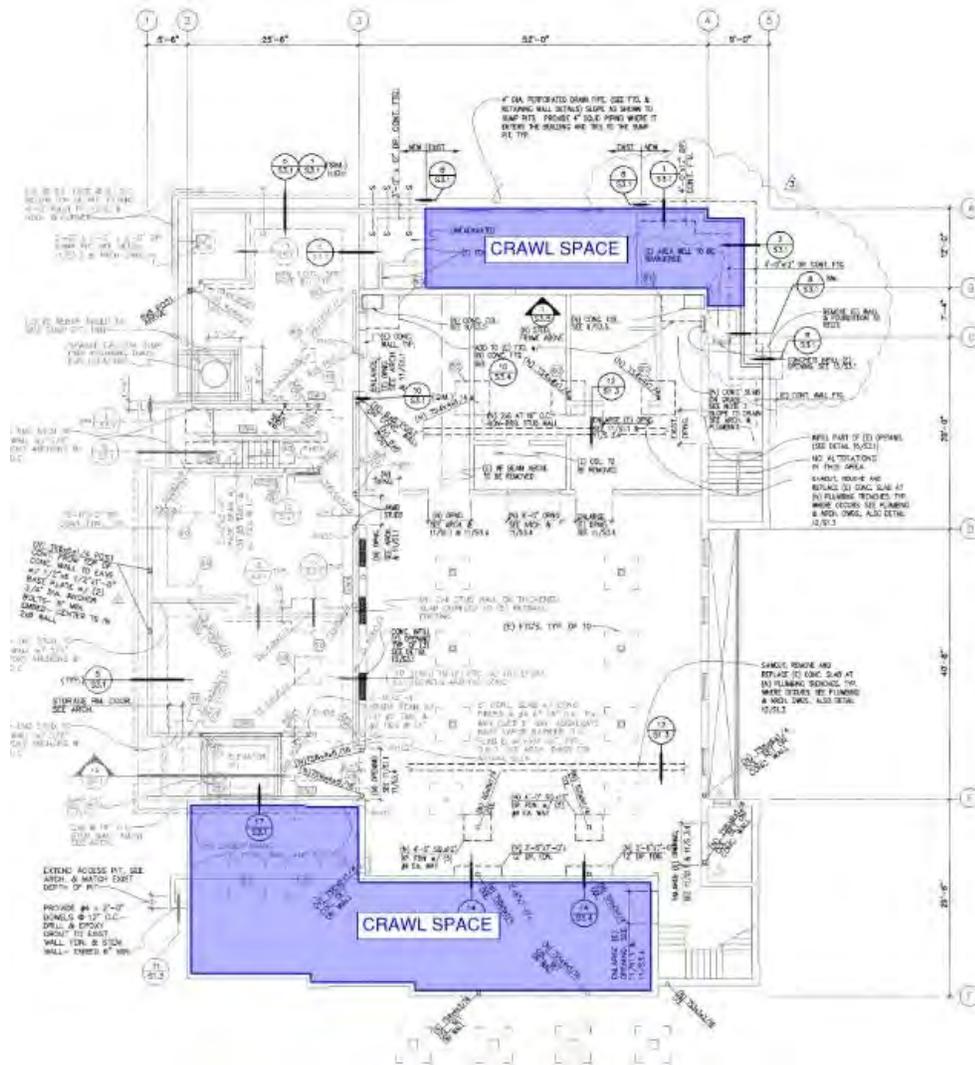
Foundation plan from the 2002 Construction Drawings illustrating the location of the crawl spaces.
